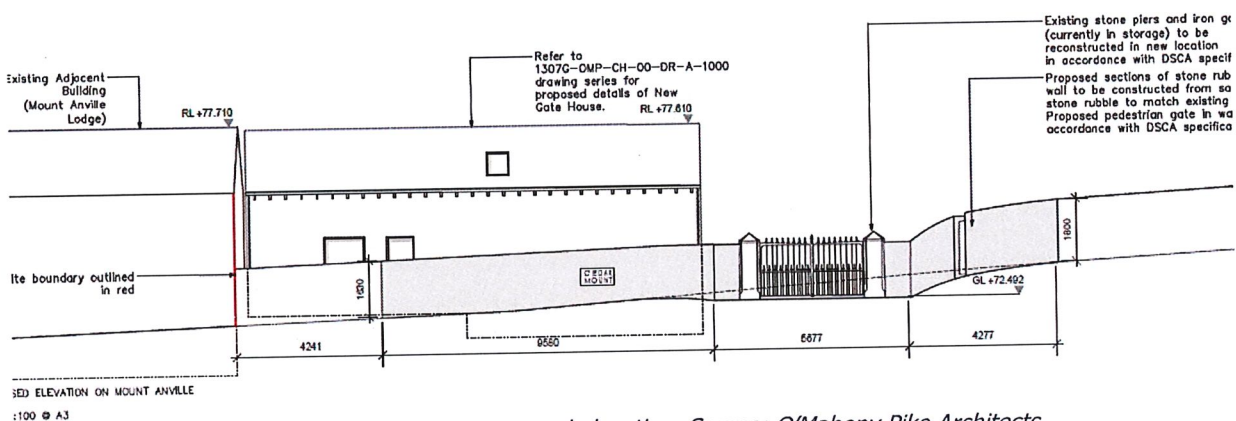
Entrance to Cedar Mount House proposed elevation. Source: O'Mahony Pike Architects.
